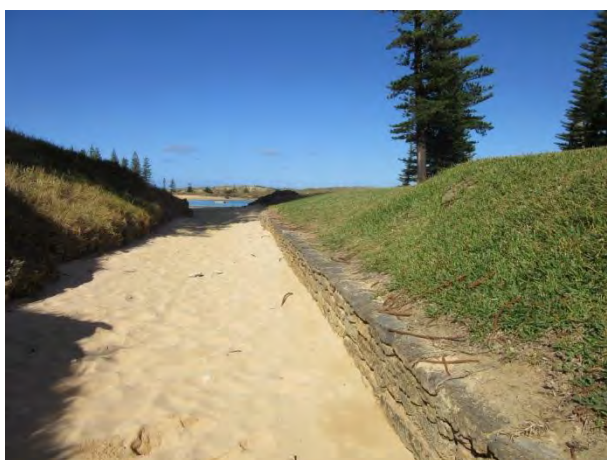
Looking east showing early 2000s calcarenite retaining wall
